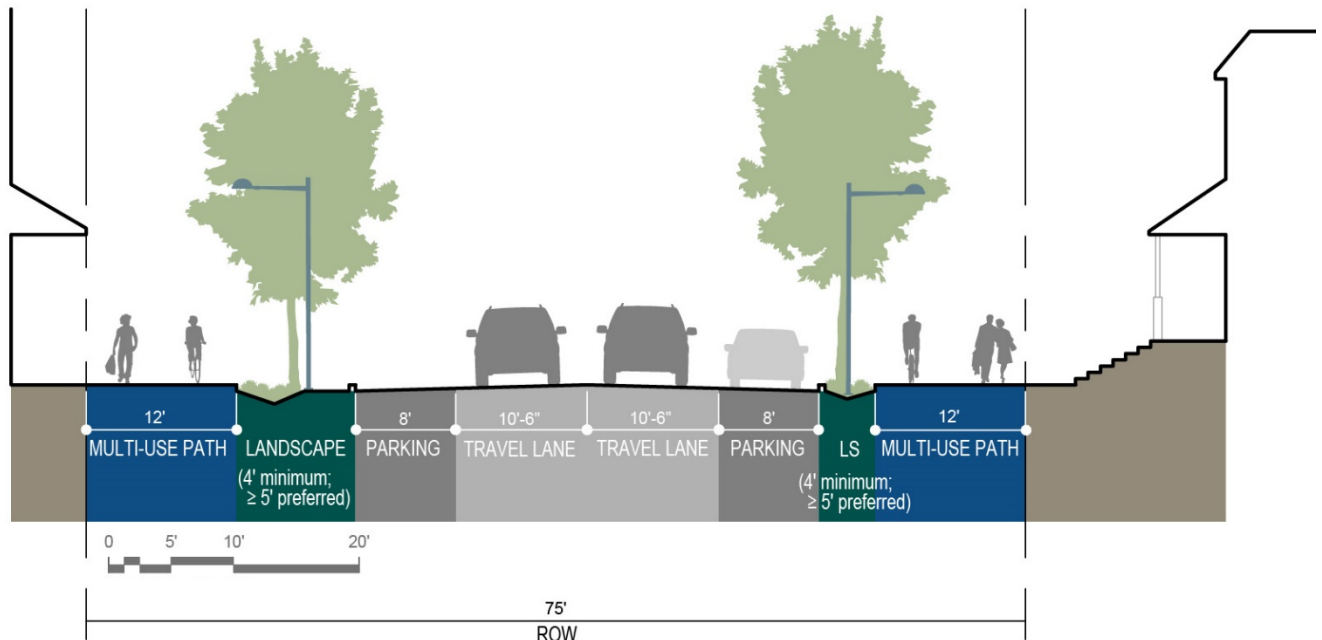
Proposed cross-section F – Alder Ave from 8th St to Grove St (looking north)
